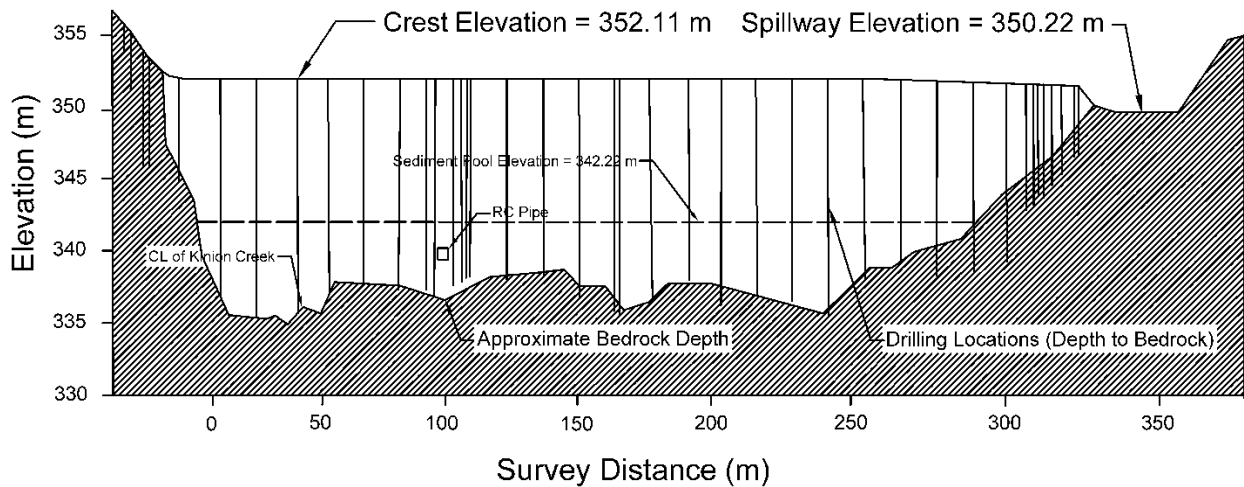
Bedrock profile modified from the 1963 drilling and grouting report showing depths to bedrock encountered during drilling (SCS, 1970).
